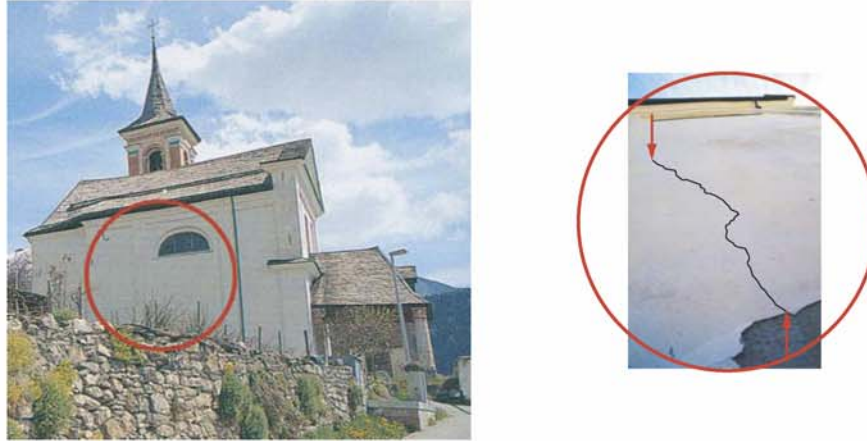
Church in Vaz: views of a damaged part [GWF 05].
